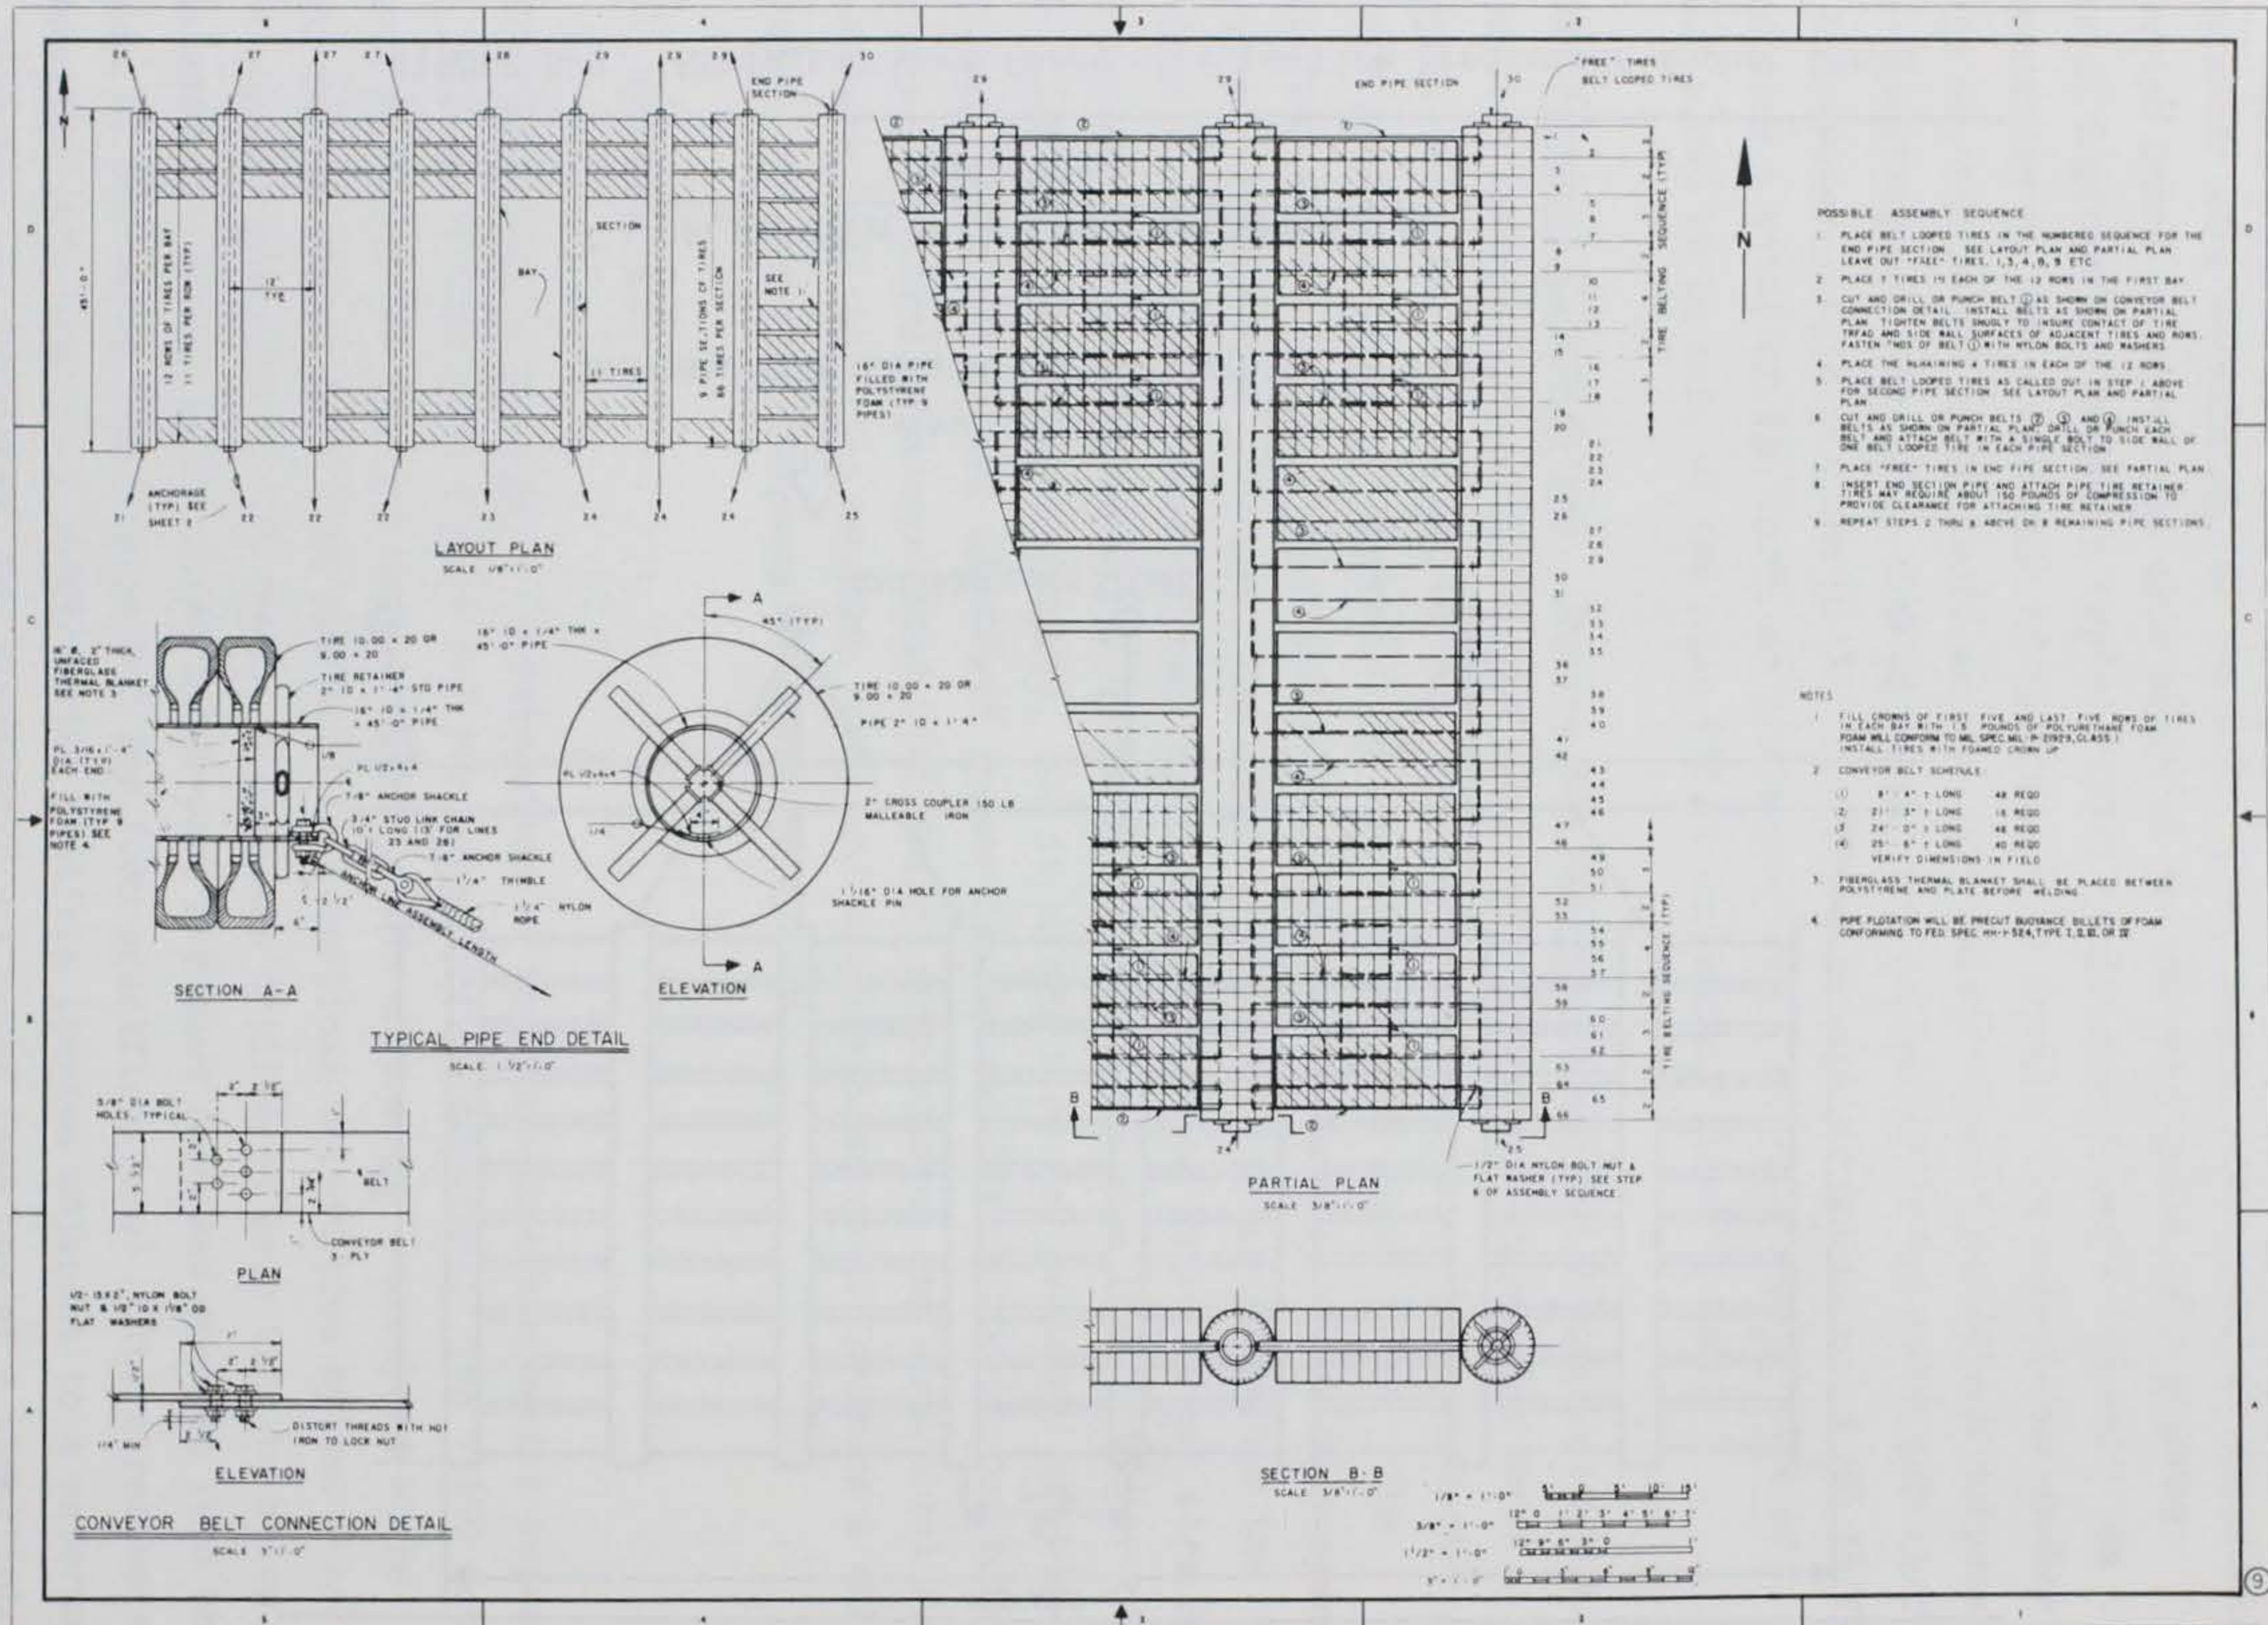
Pipe-Tire Breakwater Plan and Details
